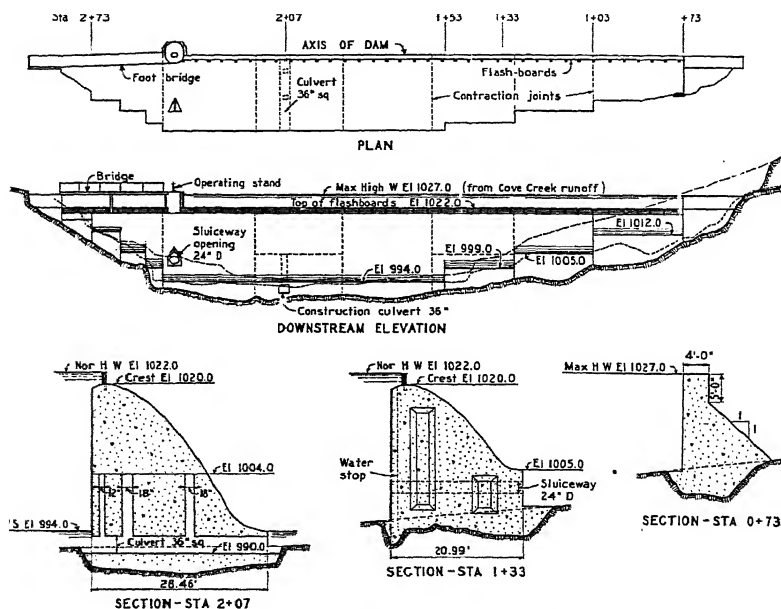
Plan, elevation, and sections of Caryville Dam.
